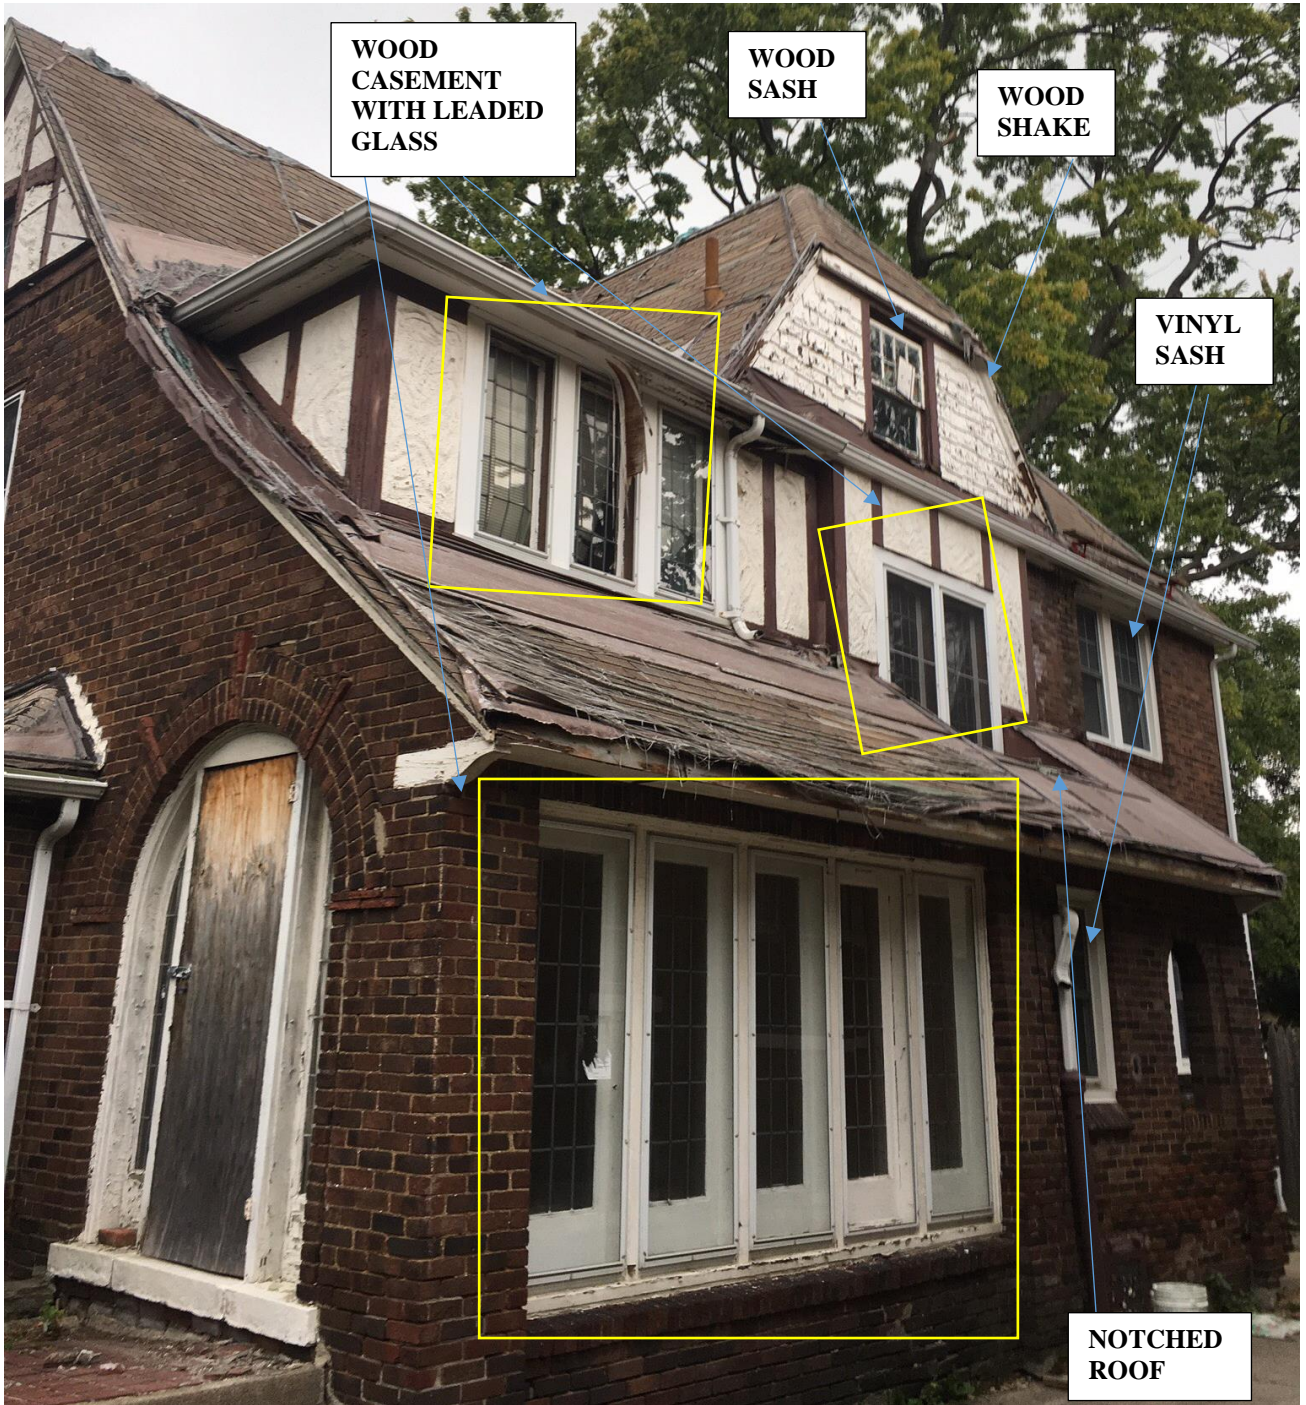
Photo taken in early 2018, prior to the fire. Note that all windows outlined in yellow are wood casement windows with leaded glass. The dormer has wood sash and the remaining visible windows at the second story are vinyl units. Also note the wood shake at the dormer and the notched roof. Source, HDC files.
